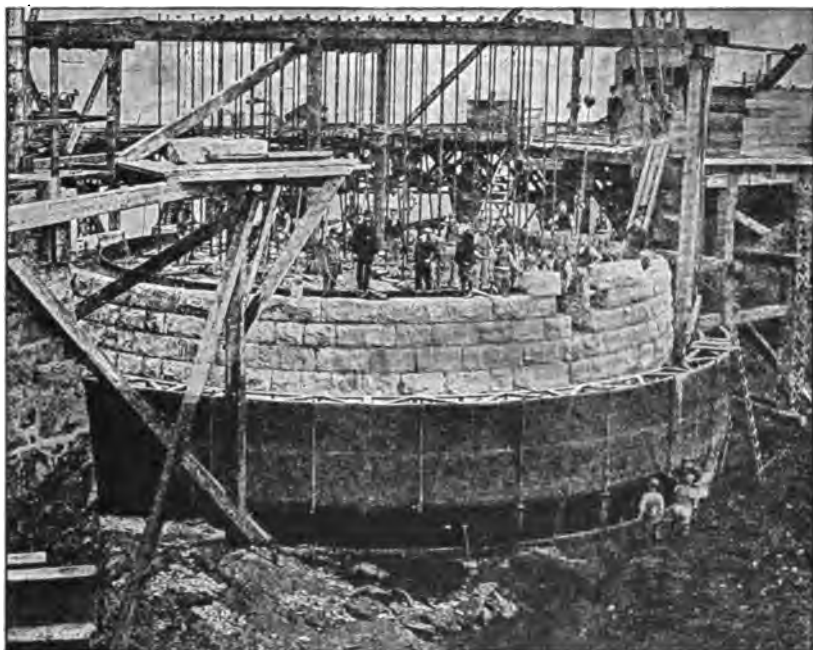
FORTH BRIDGE. CIRCULAR GRANITE PIER AND METAL COFFER-DAM.
